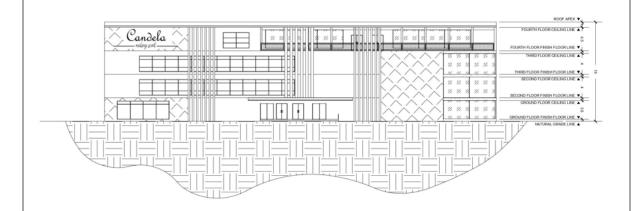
Office, Store and Factory Floor Plan: Front Elevation
